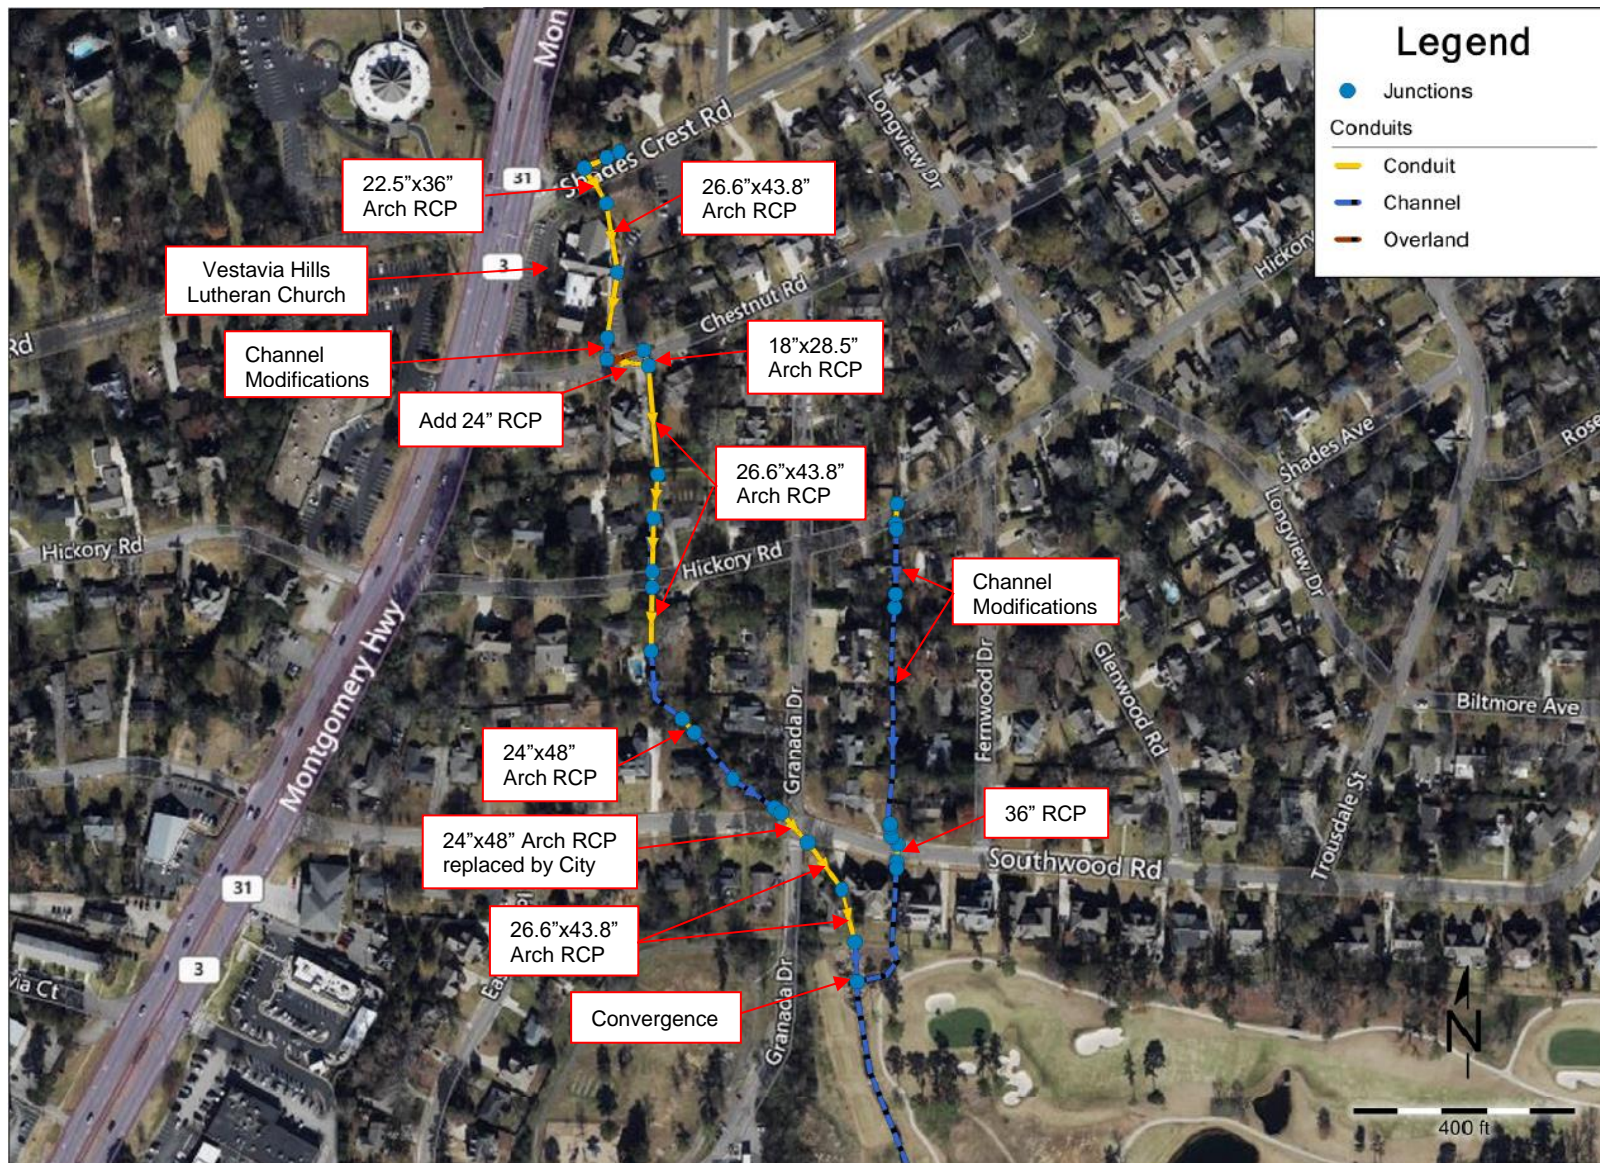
Schematic Design of Mitigation Alternative on Central Trunkline and Fernwood Road
